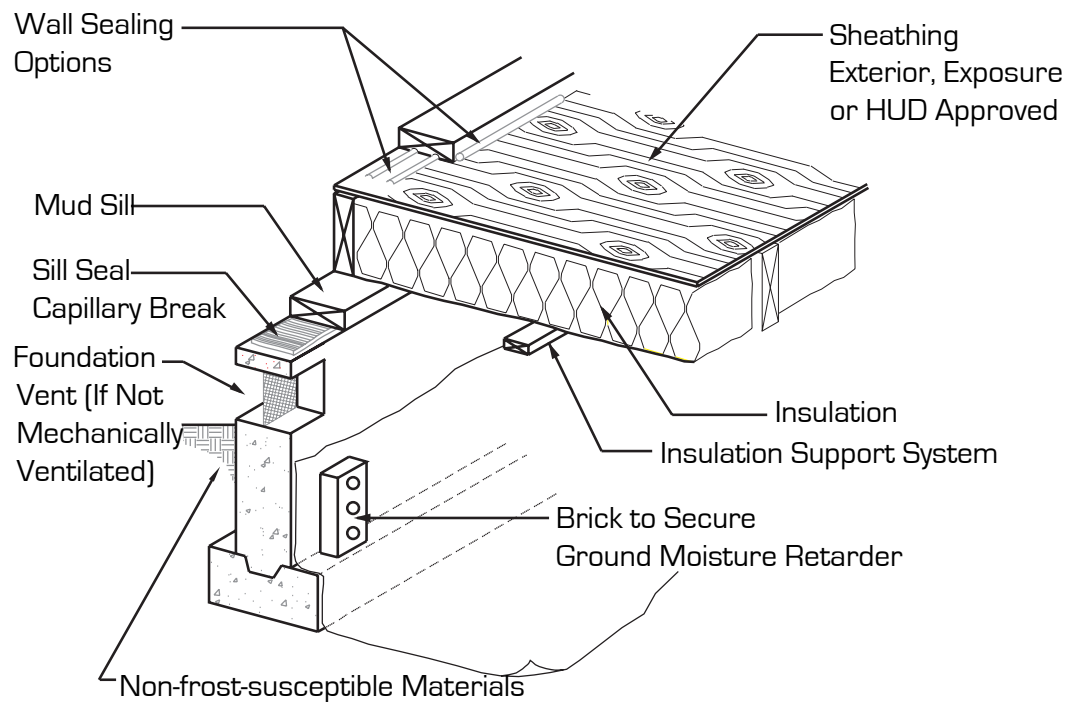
Sealing a joisted floor and ventilating the crawlspace
